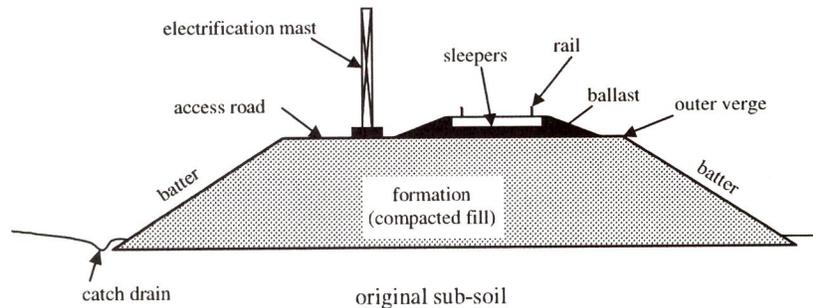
Typical cross-section of a railway embankment (not drawn to scale)
